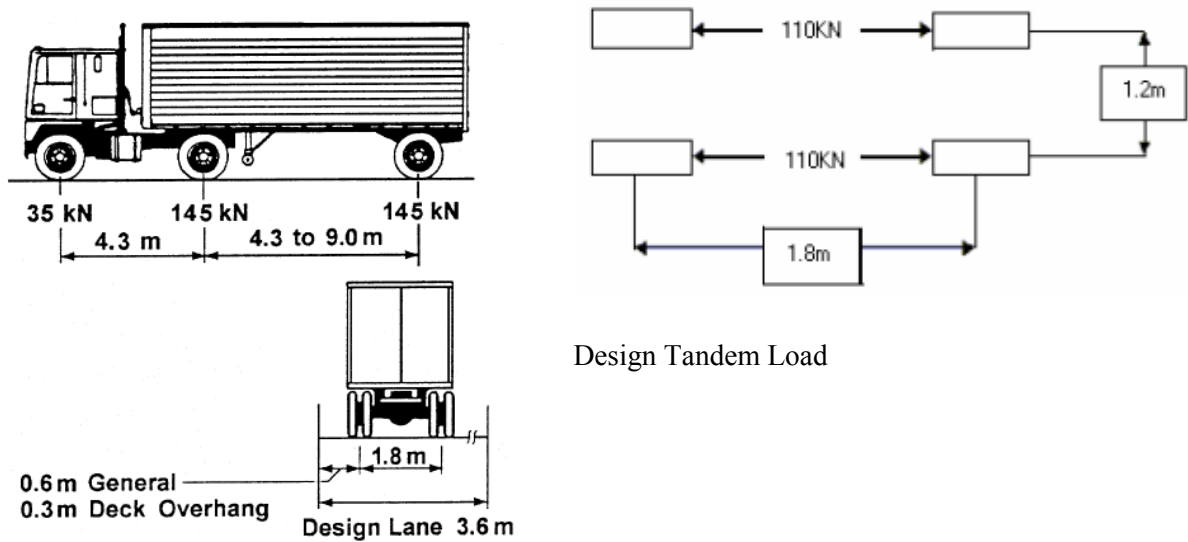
AASHTO-LRFD Design Truck, Design Tandem and Design Lane Load
